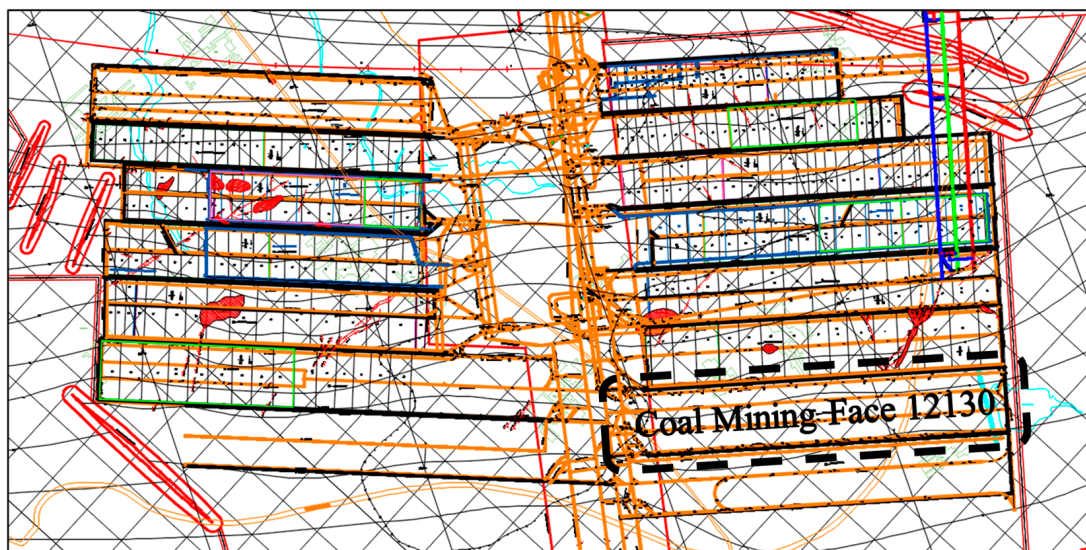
Plan view of mining and excavation projects in the Shoushan Mine area.
